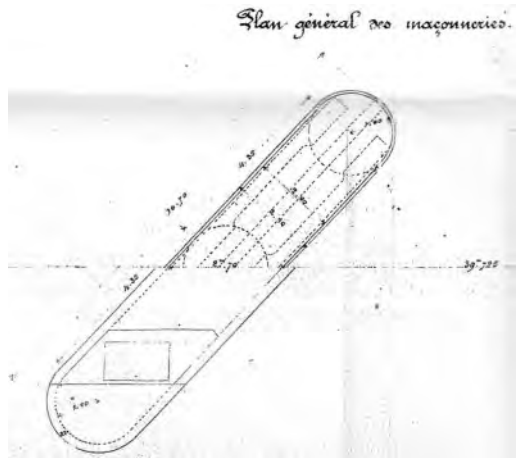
Cruet Bridge: the arrangement of the cast iron tubes and their connections (Courtesy of ACN&P).
